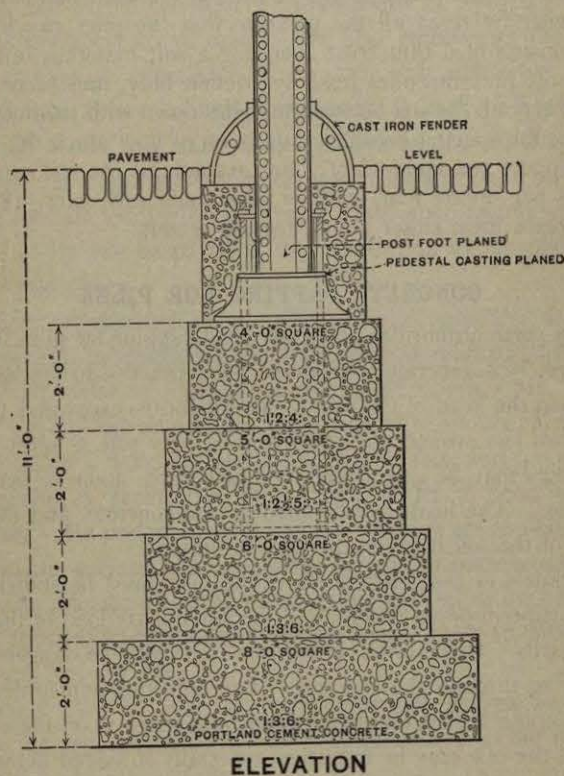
Typical Column Foundations of Boston Elevated Railway,
